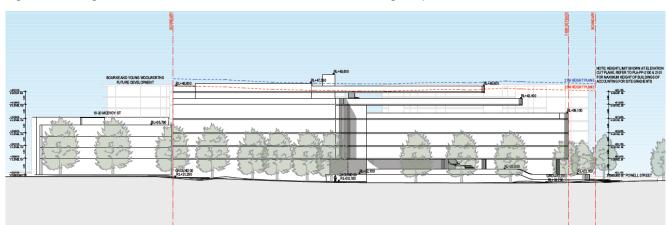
Hunter Street elevation. Source: Plus Architecture Urban Design Report
